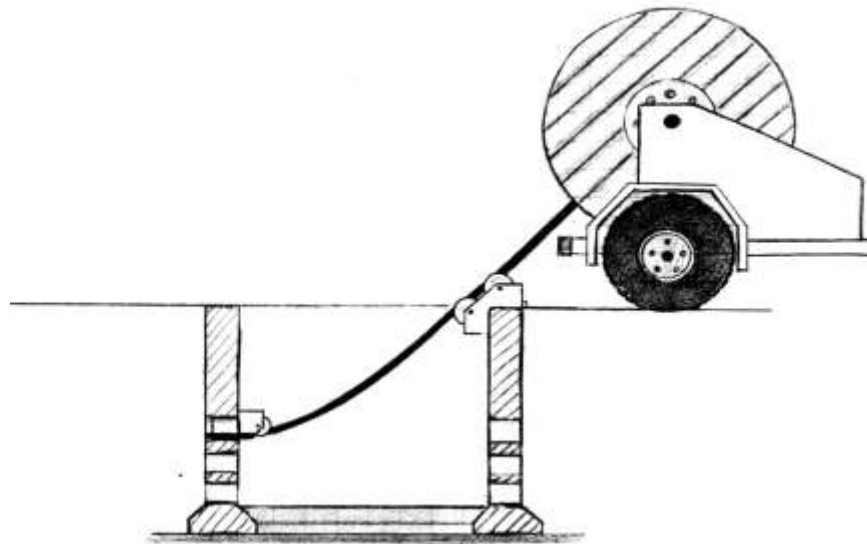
Pull End Setup for Polymer cable – Transformer Base
